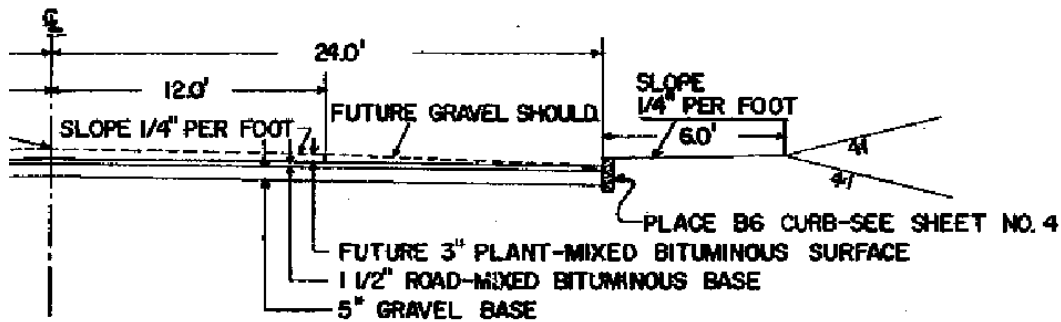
TH 71 mainline typical section (1956 construction plan)
